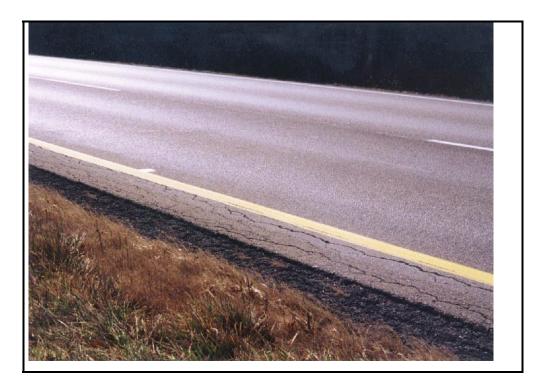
Edge Cracking in Flexible Pavement, Medium Severity
